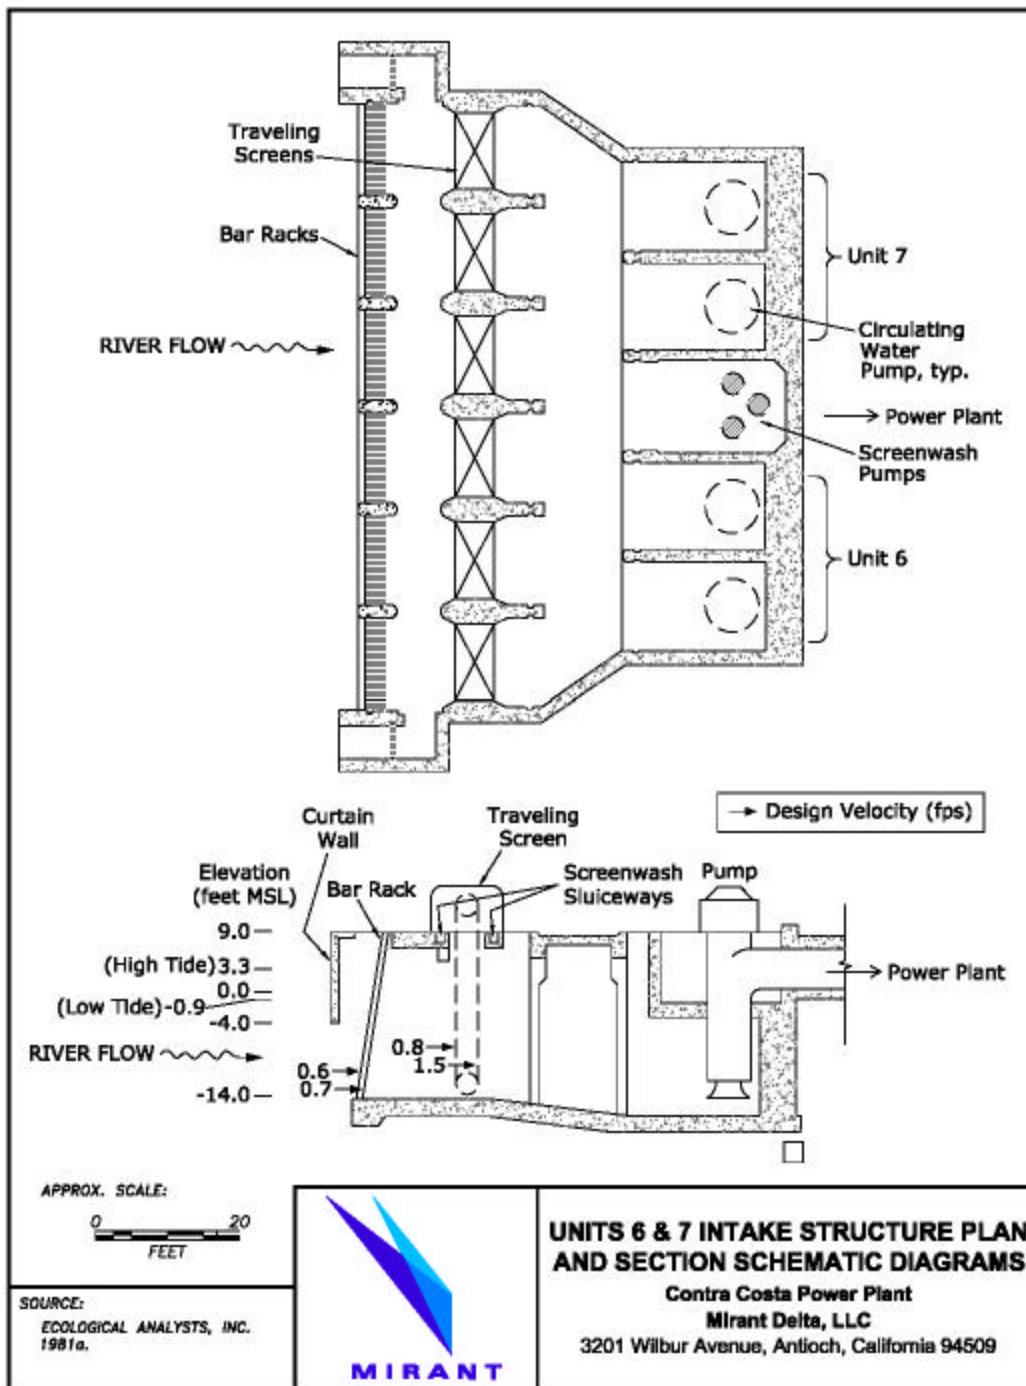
Plan and section schematic diagrams of the Contra Costa Power Plant Units 6&7 intake structure.
